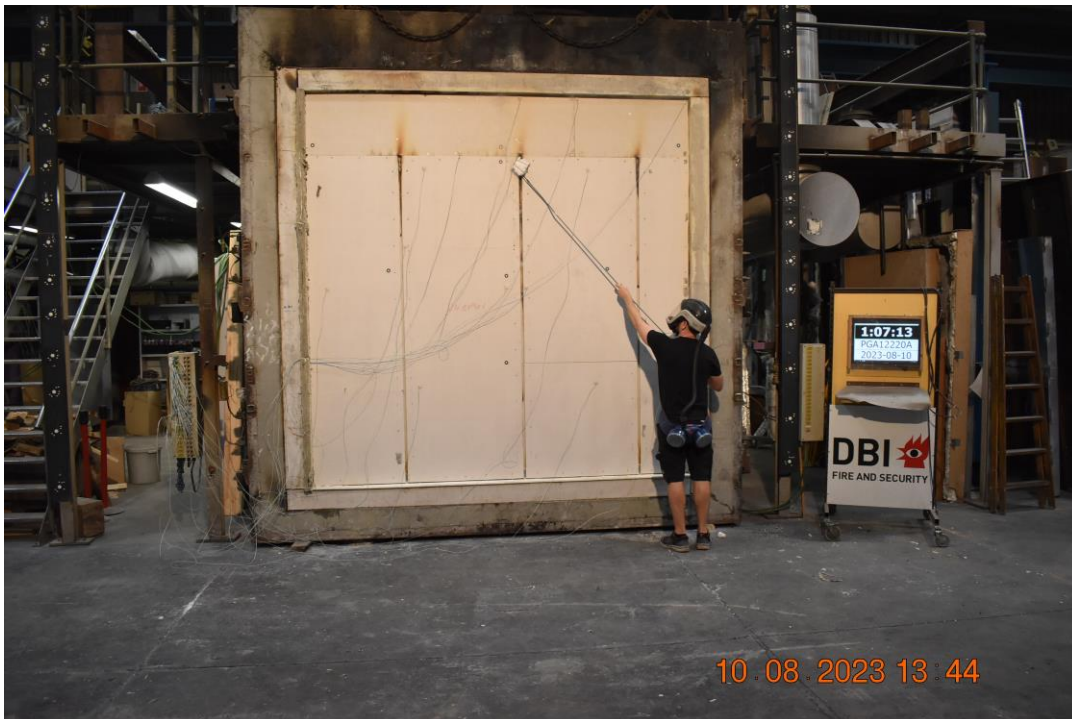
Test specimen after 67 minutes of testing. Seventh cotton pad test.
